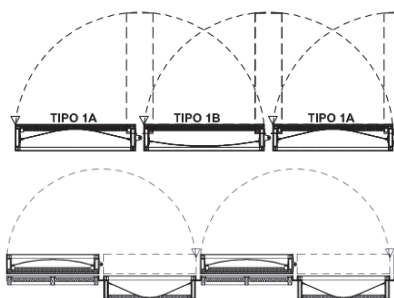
Rotating panels on lateral walls (up) and front and rear walls (down)
